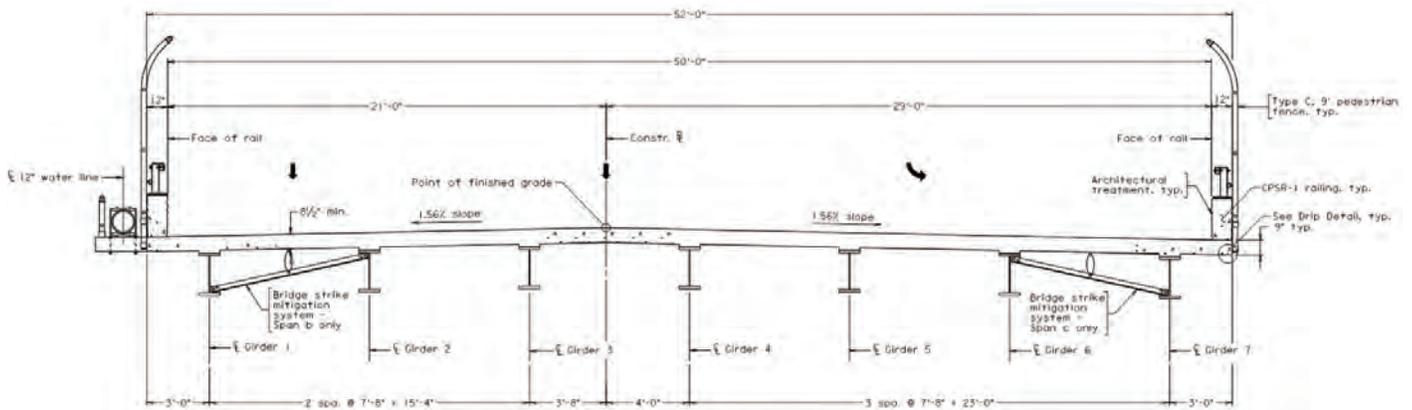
5th Street Bridge Proposed Transverse Section
